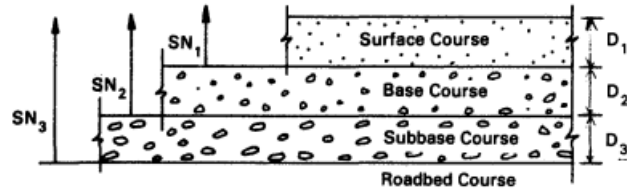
Structural Number of the flexible pavement,(AASHTO, 2001)
